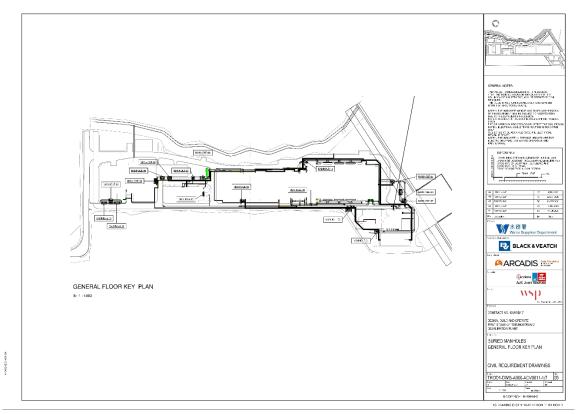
Landfill Gas Monitoring Location For Manholes/Pits
